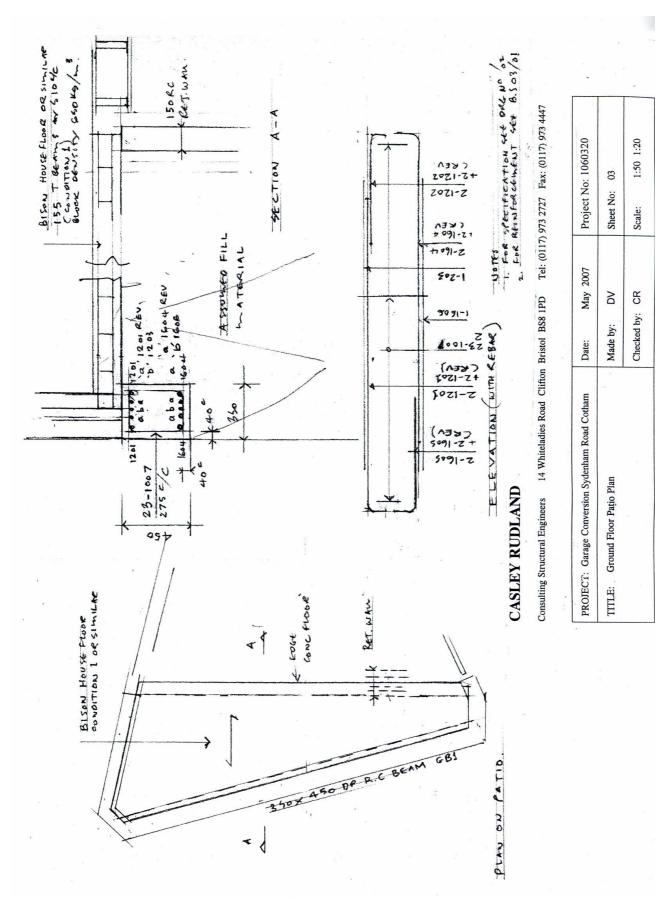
Supporting beam for patio wall at north end of building Page 14
